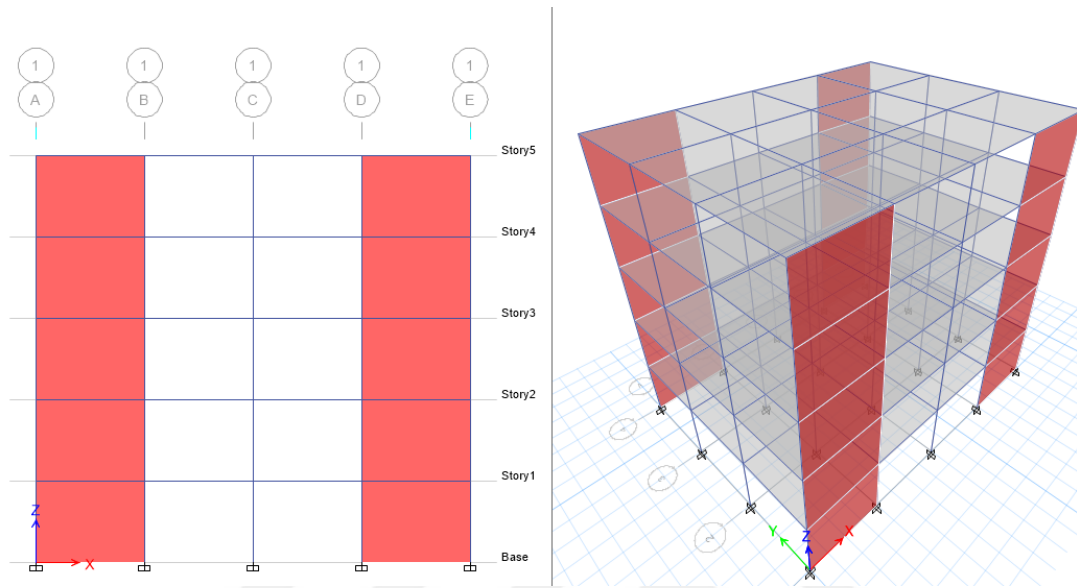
The 5-story building with concrete shear walls and without openings.
